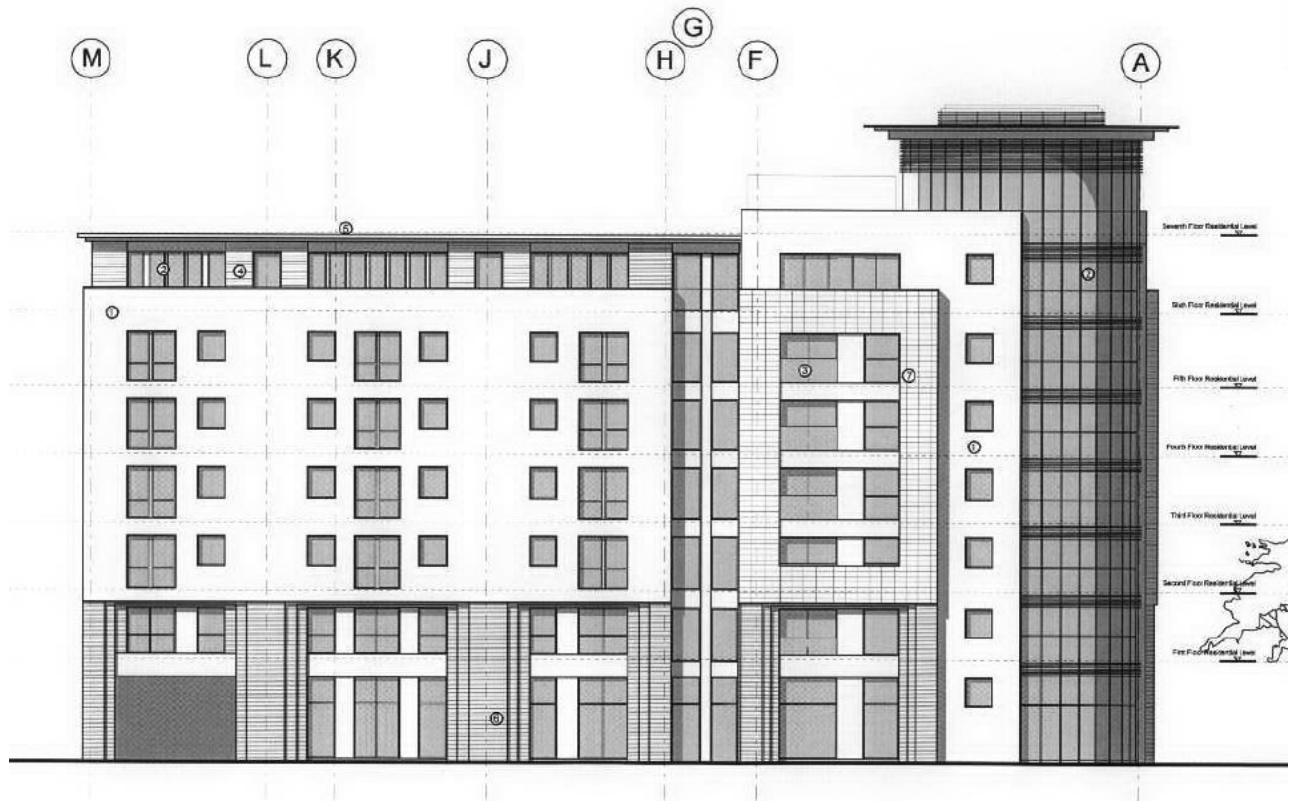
Approved St. Albans Road elevation for planning application 07/00498/FULM.
